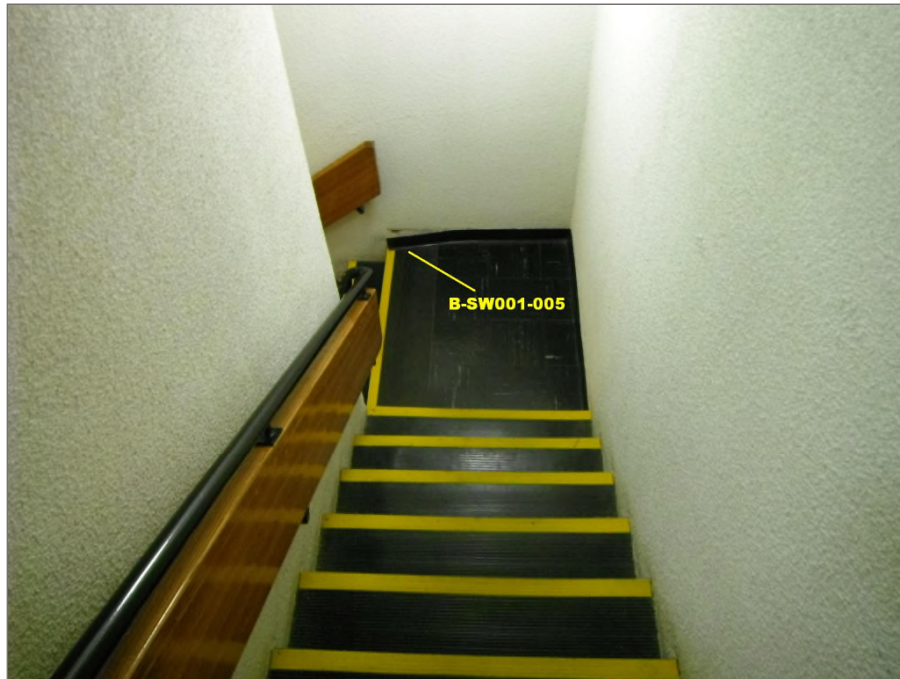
Asbestos-containing 12"x12" black with white fleck vinyl floor tile in eastern stairwell. Tetra Tech sample B-SW001-005.
